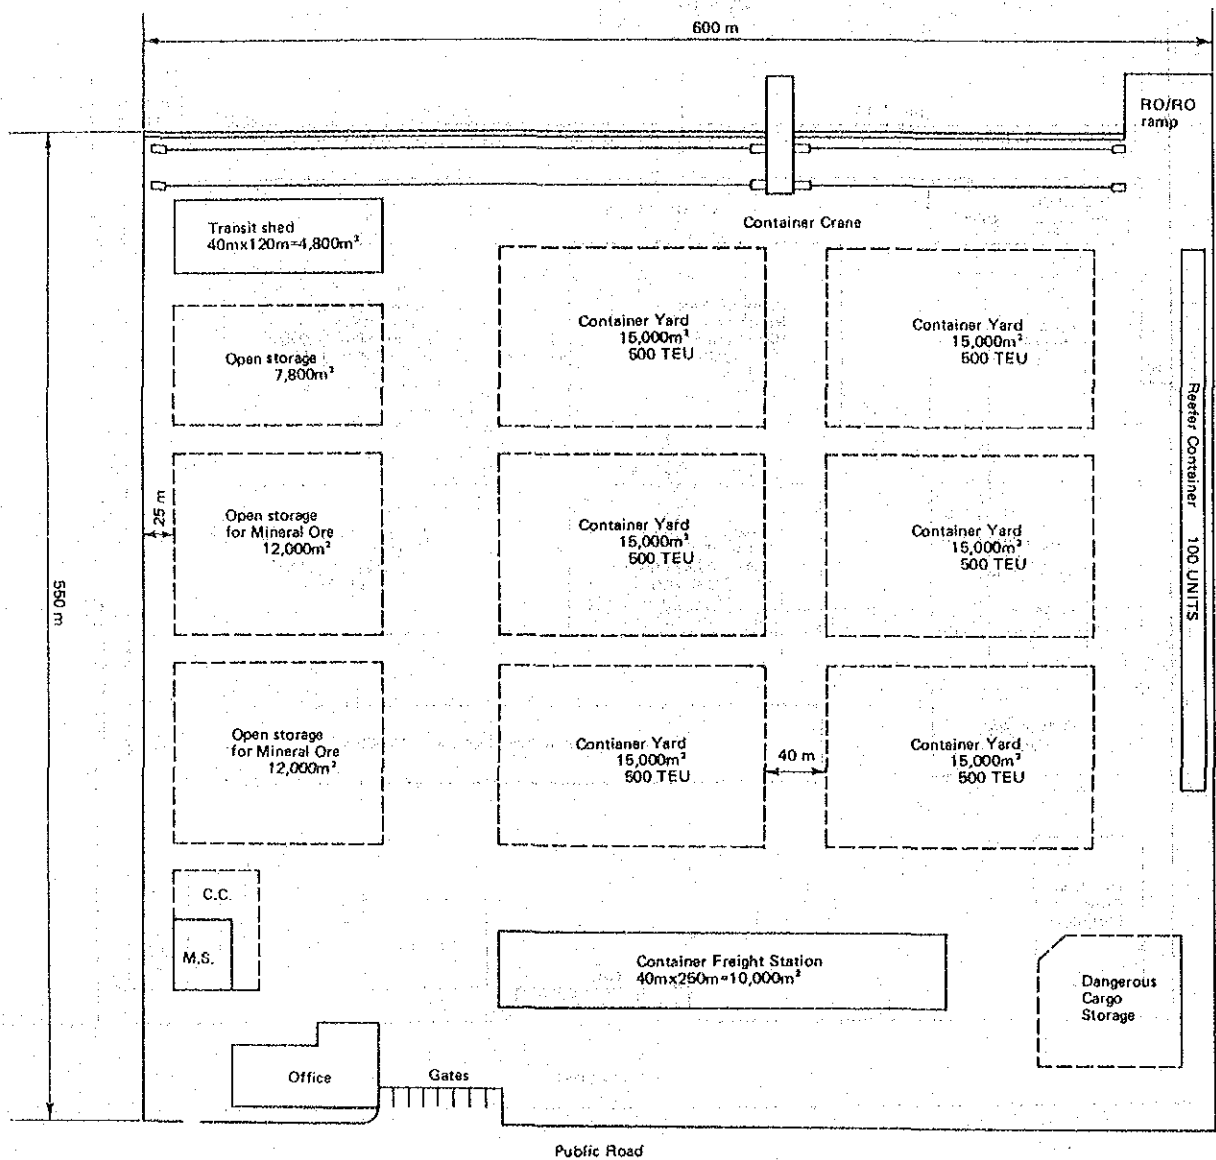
(b) An example of layout for Multi-Purpose Terminal (Chassis System).
